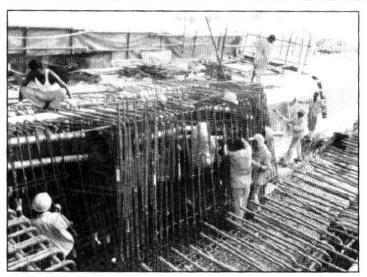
Workers engaged in placing reinforcements and cable ducts at place
